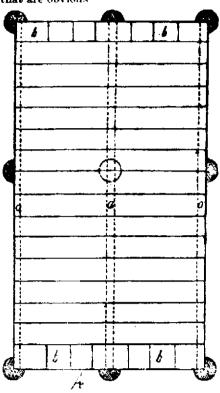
FOLD HOUSE, GROUND PLAN. A is a 11-n of the house, showing three sills, a, a a f 4x2 lumber, placed on edge, and nesting on nine blocks fifteen inches high the those sills the flooring is laid (inch ther heards, no joist necessary);
